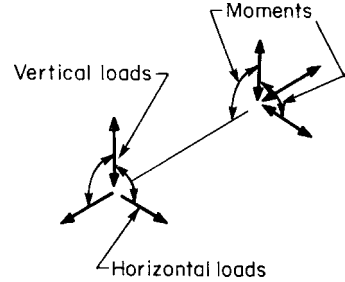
Typical loads acting on foundations for two-legged framed structures.
